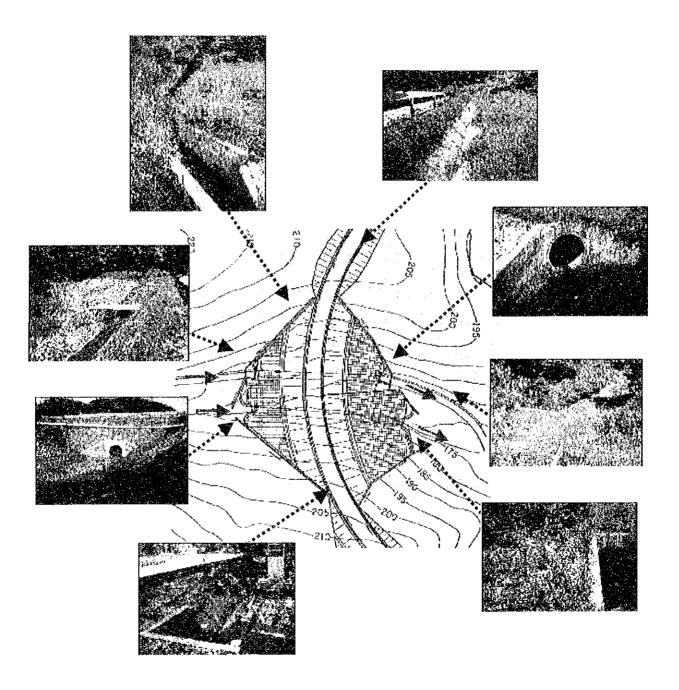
Drainage System of Mountainous Road and Existing Drainage Facilities in East-West Highway
